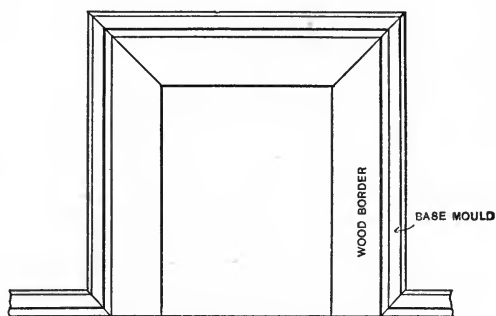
Installing Furnace Plants in Old Houses.—Method of Arranging for Side Wall Register.
